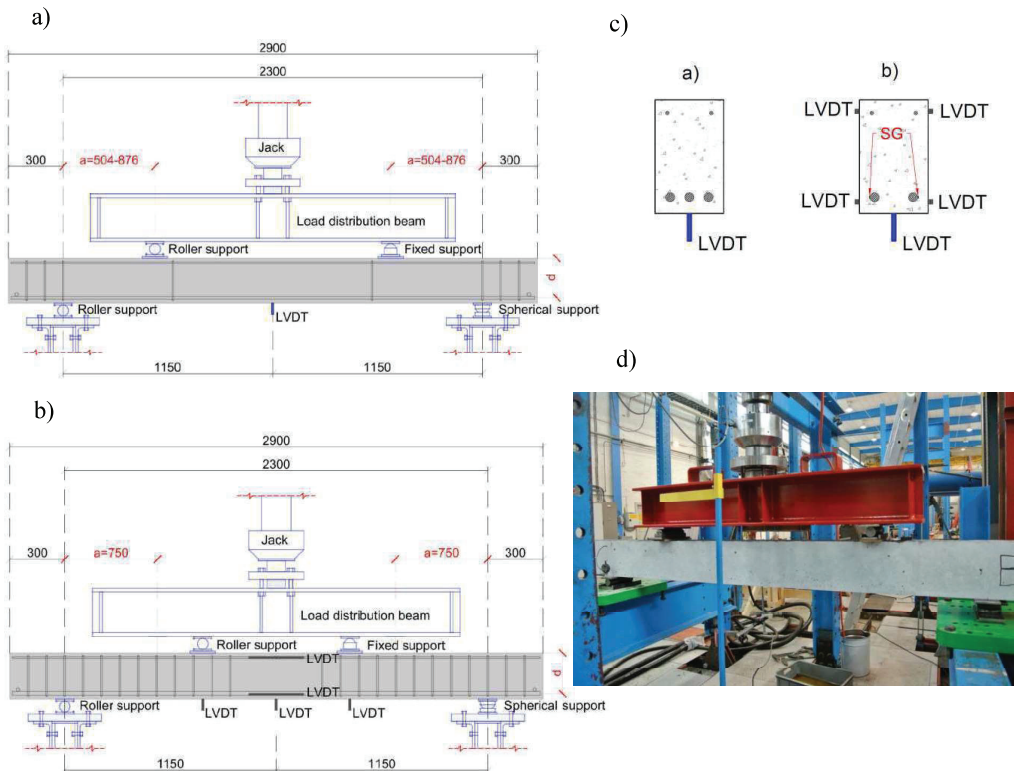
Test set-up off beams a) without shear reinforcement; b) with shear reinforcement; c) detail middle cross section for beam without and with shear reinforcement; d) view from the laboratory.
